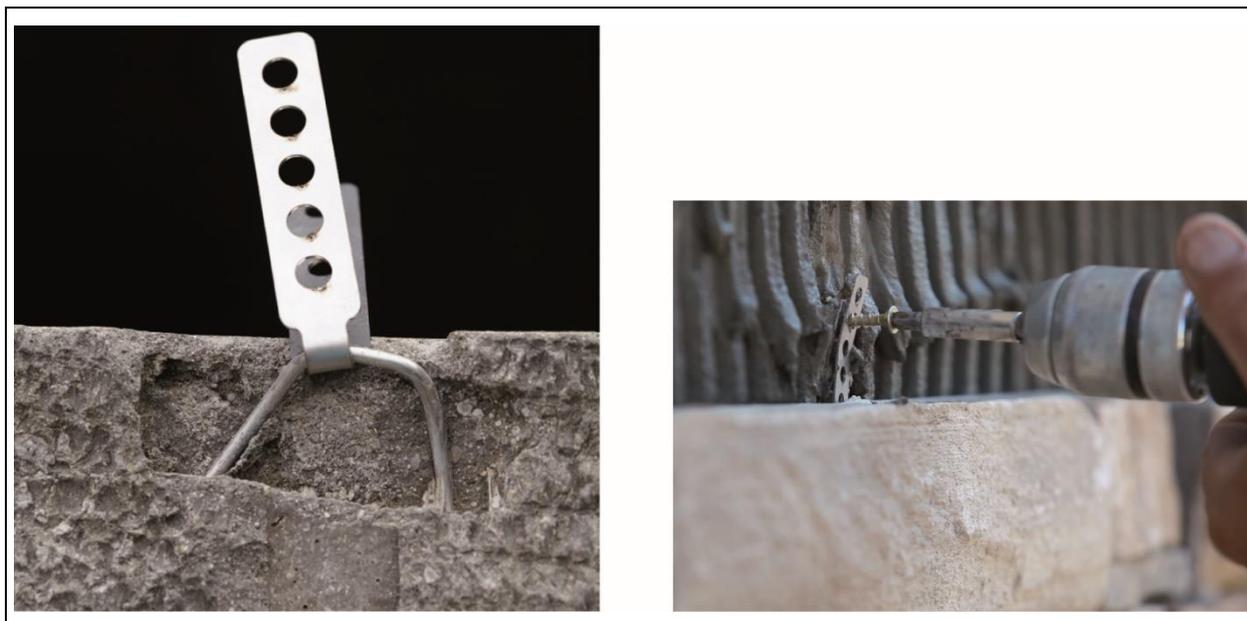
Perforated steel band looped through the anchor and fixed in the wall
